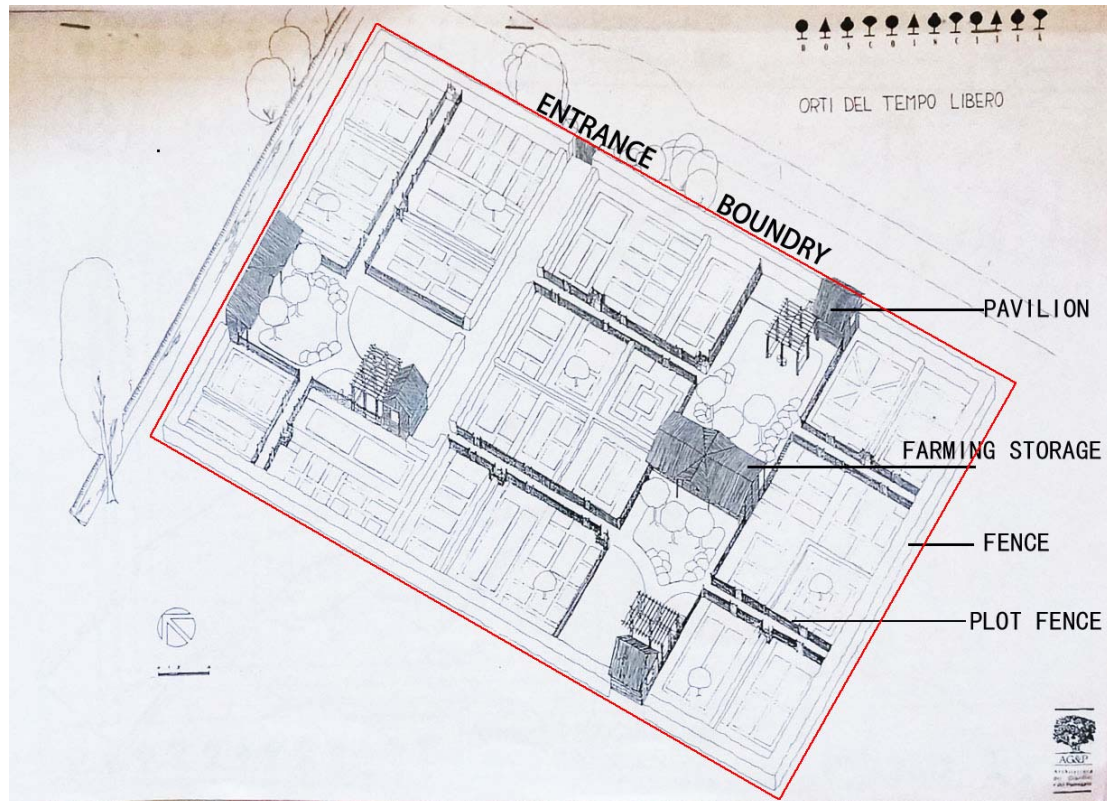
Site plan of LIBRE garden<sup>21</sup>
